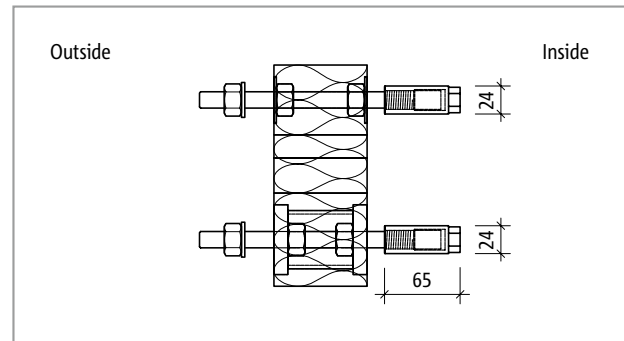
Schöck Isokorb® T type S with cap nuts: Product section
